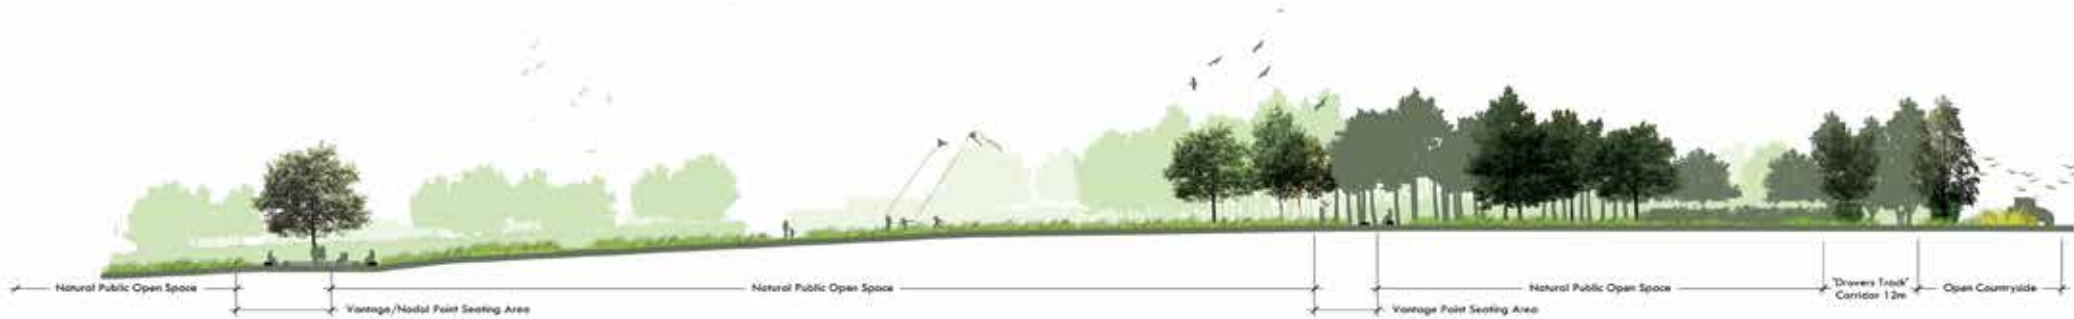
HIGH LAND PARK ILLUSTRATIVE SECTION & SKETCH PLAN
